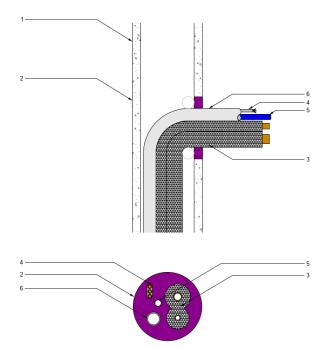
2hr minimum 116 mm flexible wall, minimum 2 layers of fire rated plasterboard either side, FRL -/120/120 and Rigid walls FRL - /120/120 and FRL 120/120/120. Typical arrangement of one-sided penetration of HVAC services protected with BOSS FireMastic-HPE sealant finished flush with the wall (please note that the drawing is just for illustration purposes, wall make up shall be as wall shown in Figure 8)
